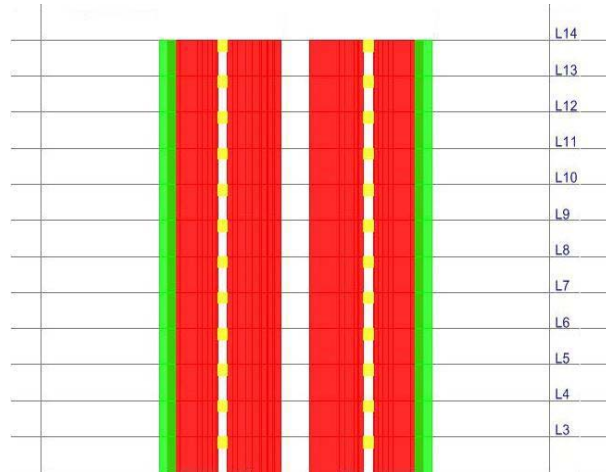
Coupled direction elevation view spanning L3 to L14
